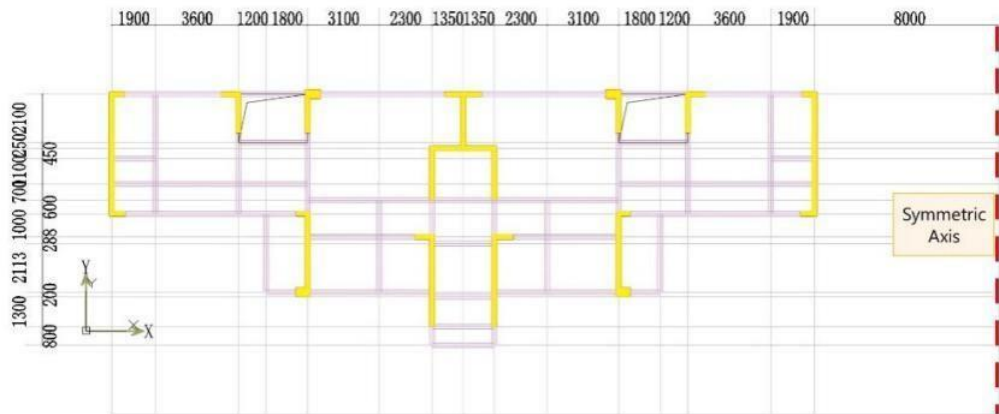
Half plan view of the towers for Model 1 (level 14) [26]
